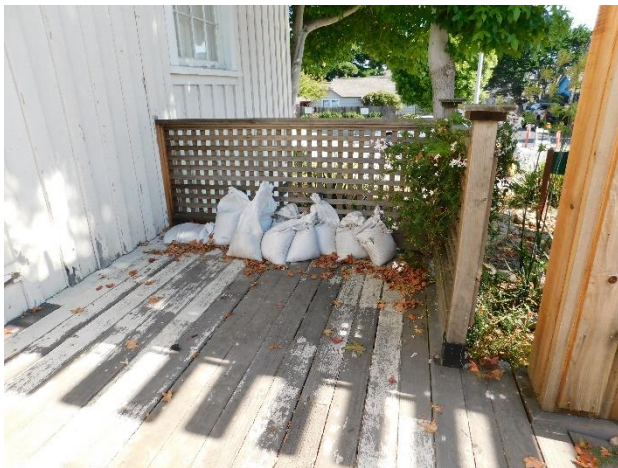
Wood guard rail at the north edge of the east deck. Note the paint remnants at the deck boards closest to the building.
